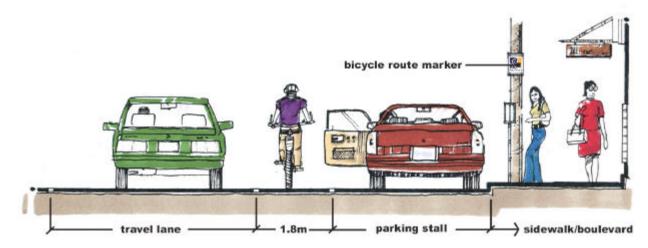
Bike Lane with On-Street Parking Cross Section
